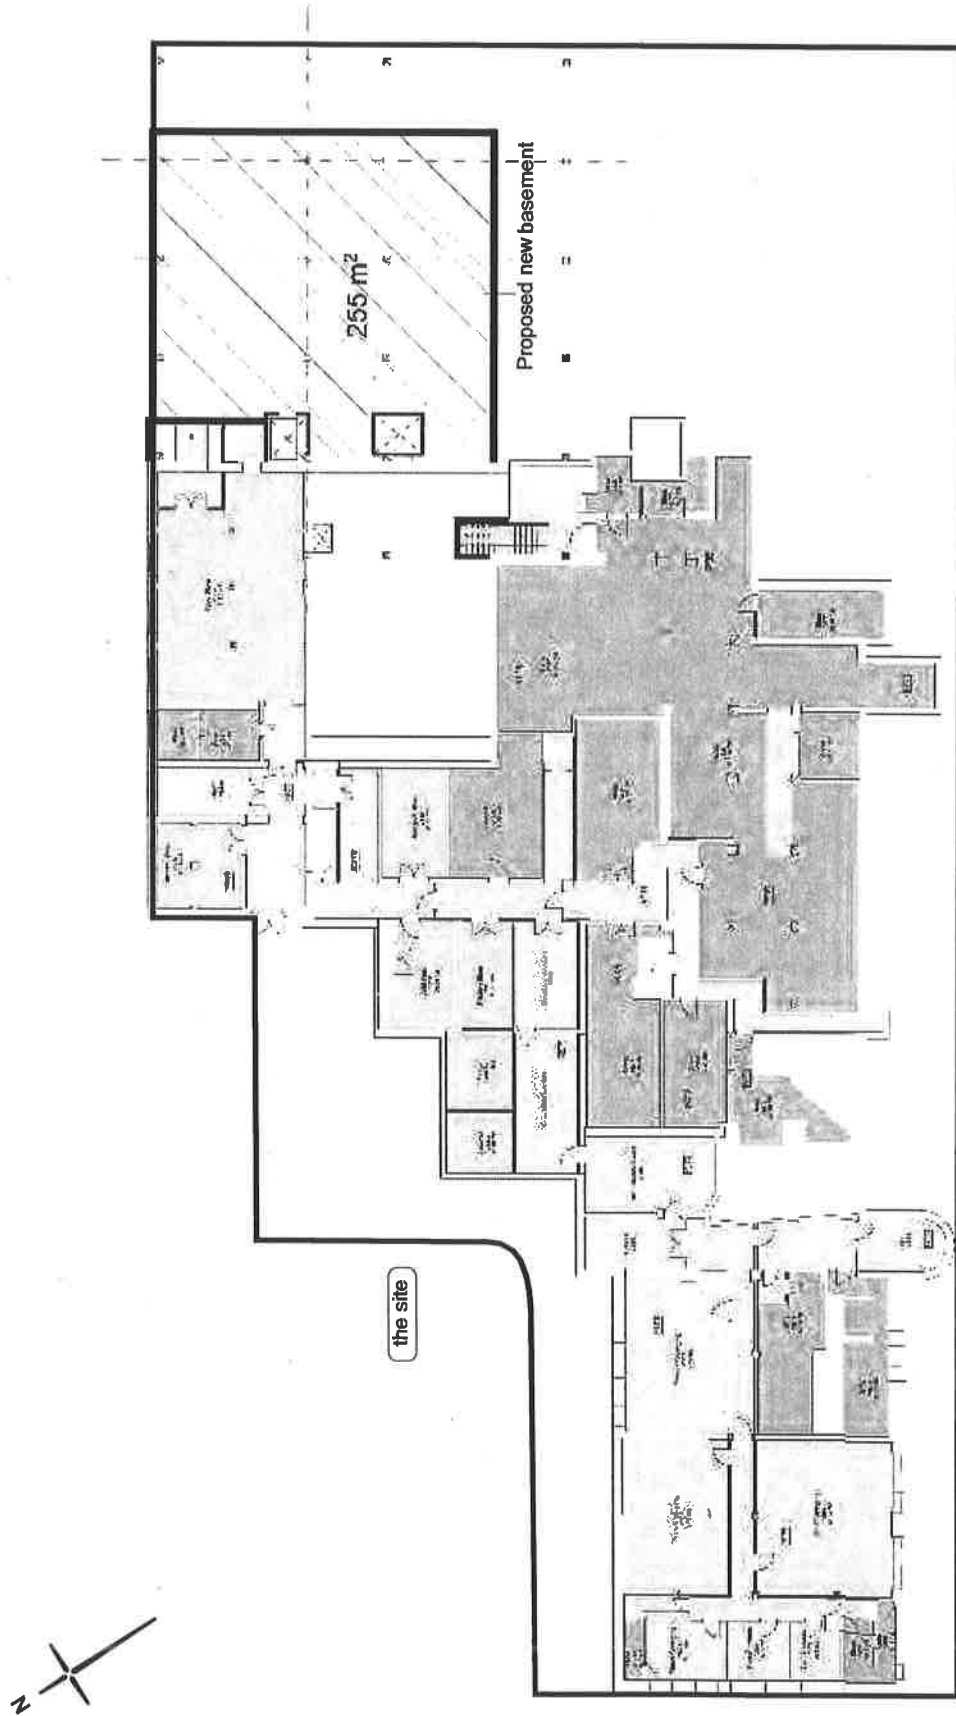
Proposed layout of existing basement and proposed new basement (Bond Bryan Architects drwg 07-036 SK 143 dated 02.07.08)
